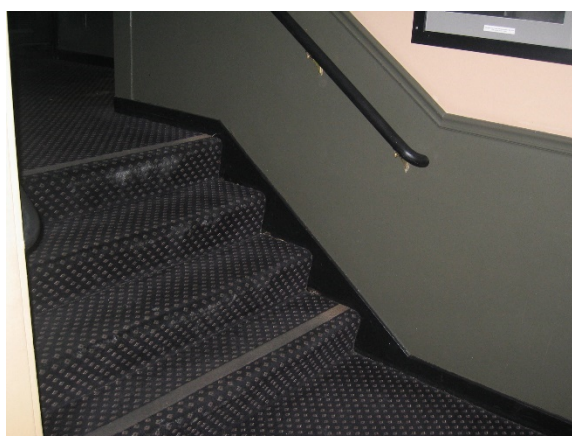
Stair #1 to 2<sup>nd</sup> Floor, missing Handrail Ext.
